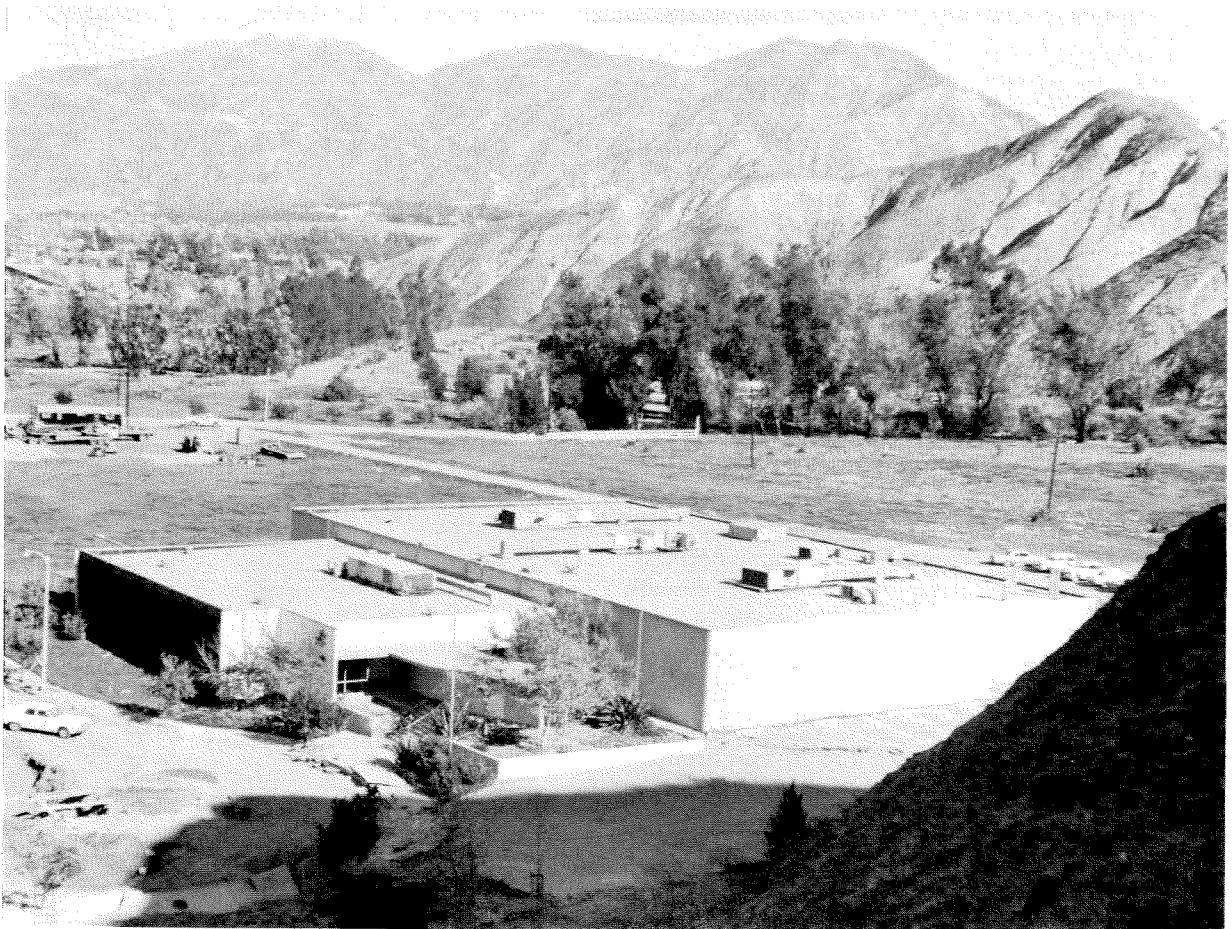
Permanent ground displacements show in the sidewalk and parking lot. Donaldson Building.
